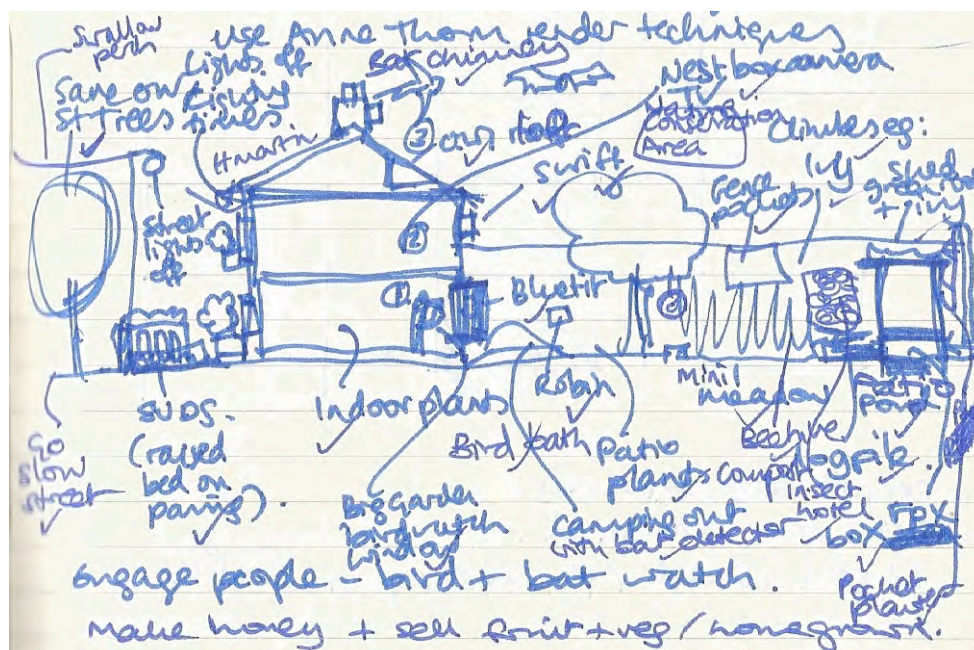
Sketch for sectional perspective drawing. Source: Siân Moxon
